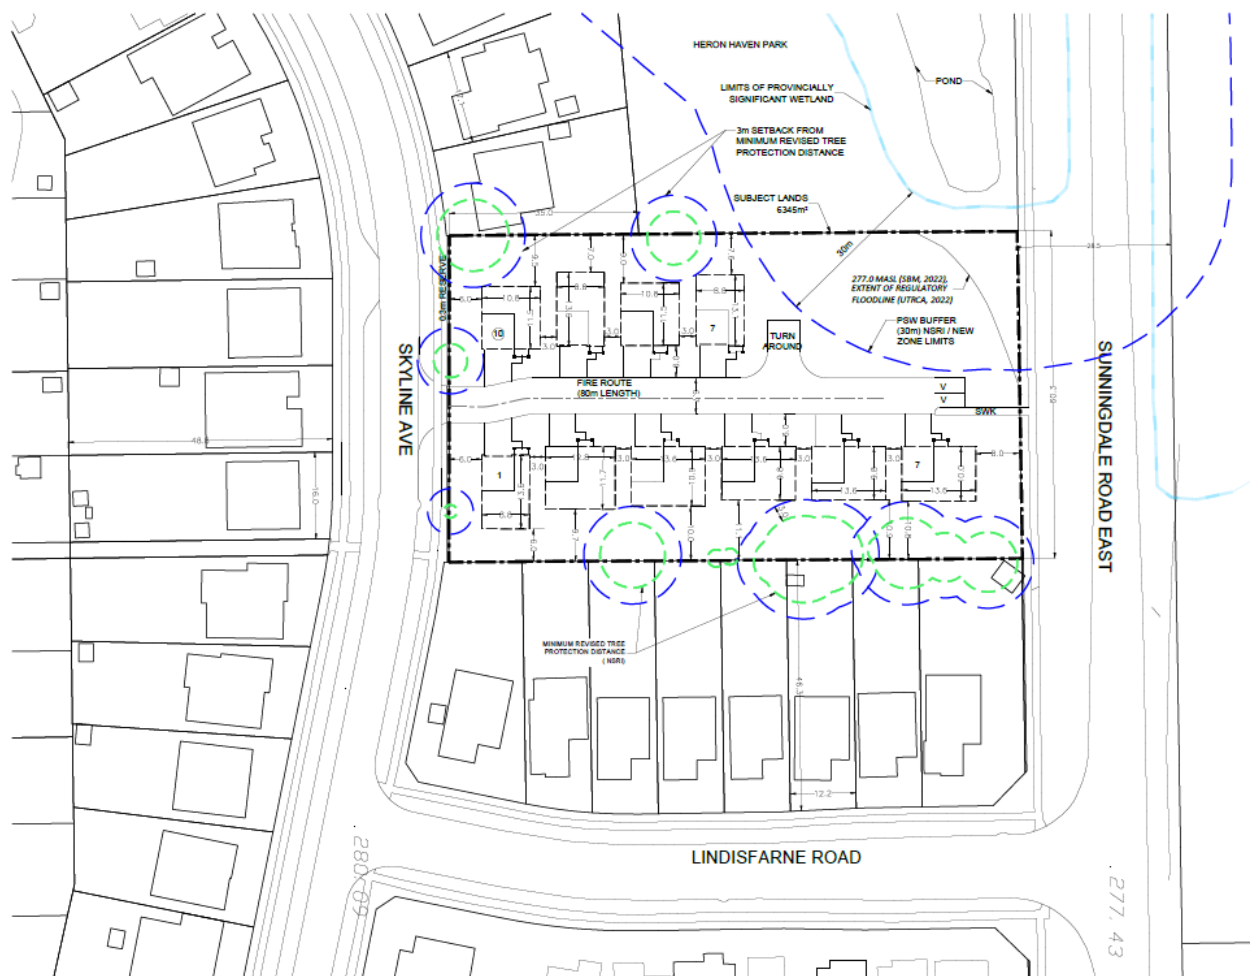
Revised Potential Development Plan for 307 Sunningdale Road East, October 4, 2022.
